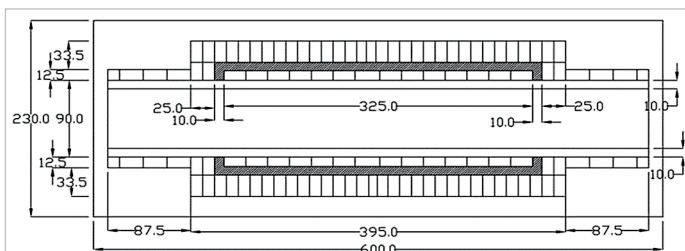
Second stage of the oven walls construction from 40 cm to 115 cm above the concrete base
